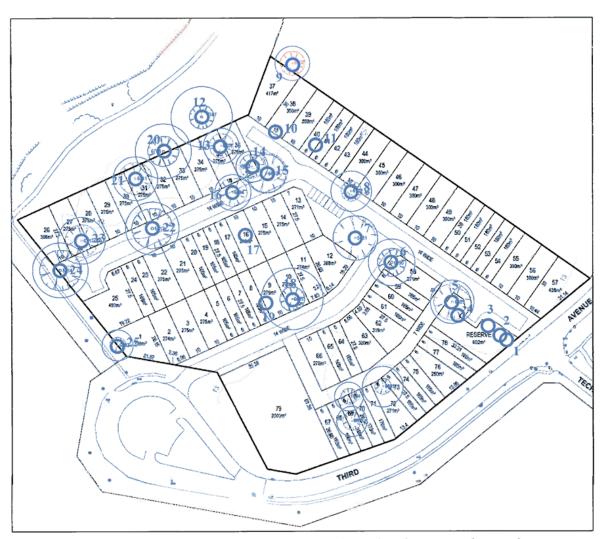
B. Site Plan – Survey plan. The survey plan of the subject site, indicating the location and labelling of the 25 trees included in this assessment. Note that some trees are not plotted on the survey plan, and their locations are indicative only.
